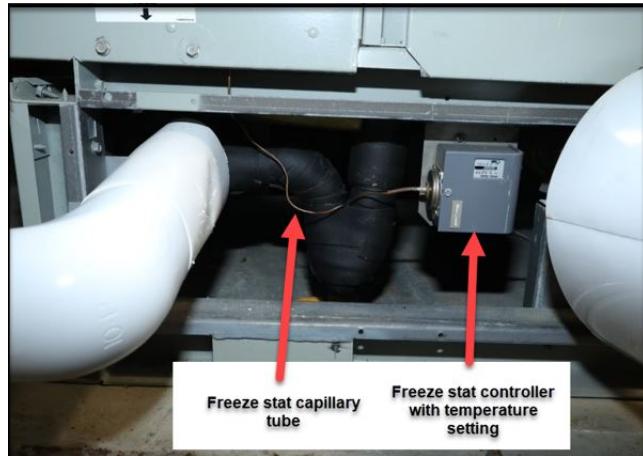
Freeze stat controller and capillary tube with cover plate removed
